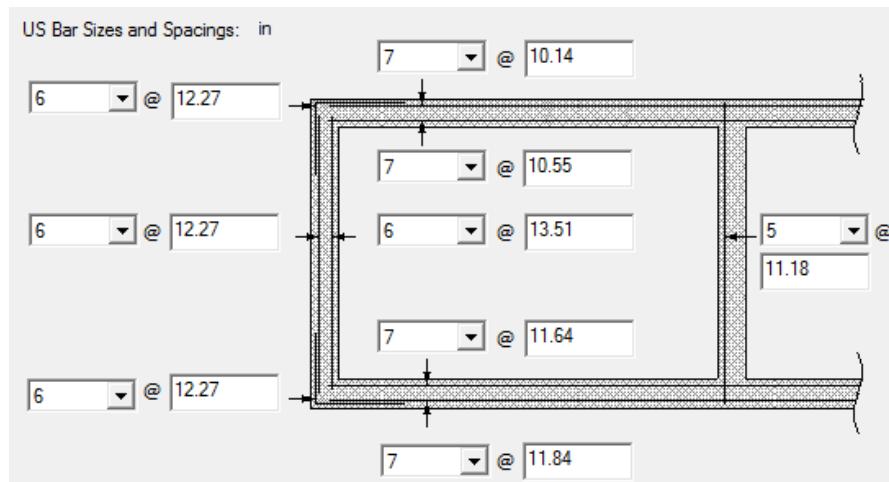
Steel Reinforcement Data Entry for RCBC Analyzed in Brass-Culvert 2.3.2
